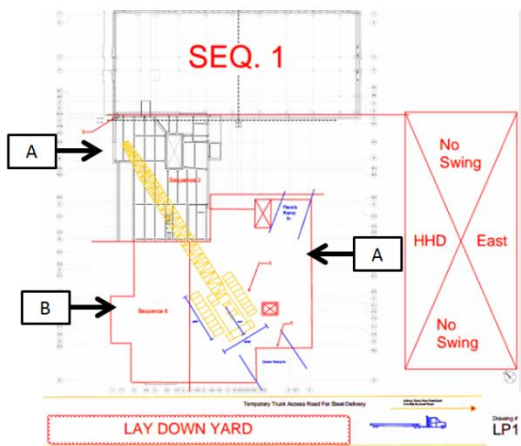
Structural Steel Sequencing (Courtesy of Kinsley)
